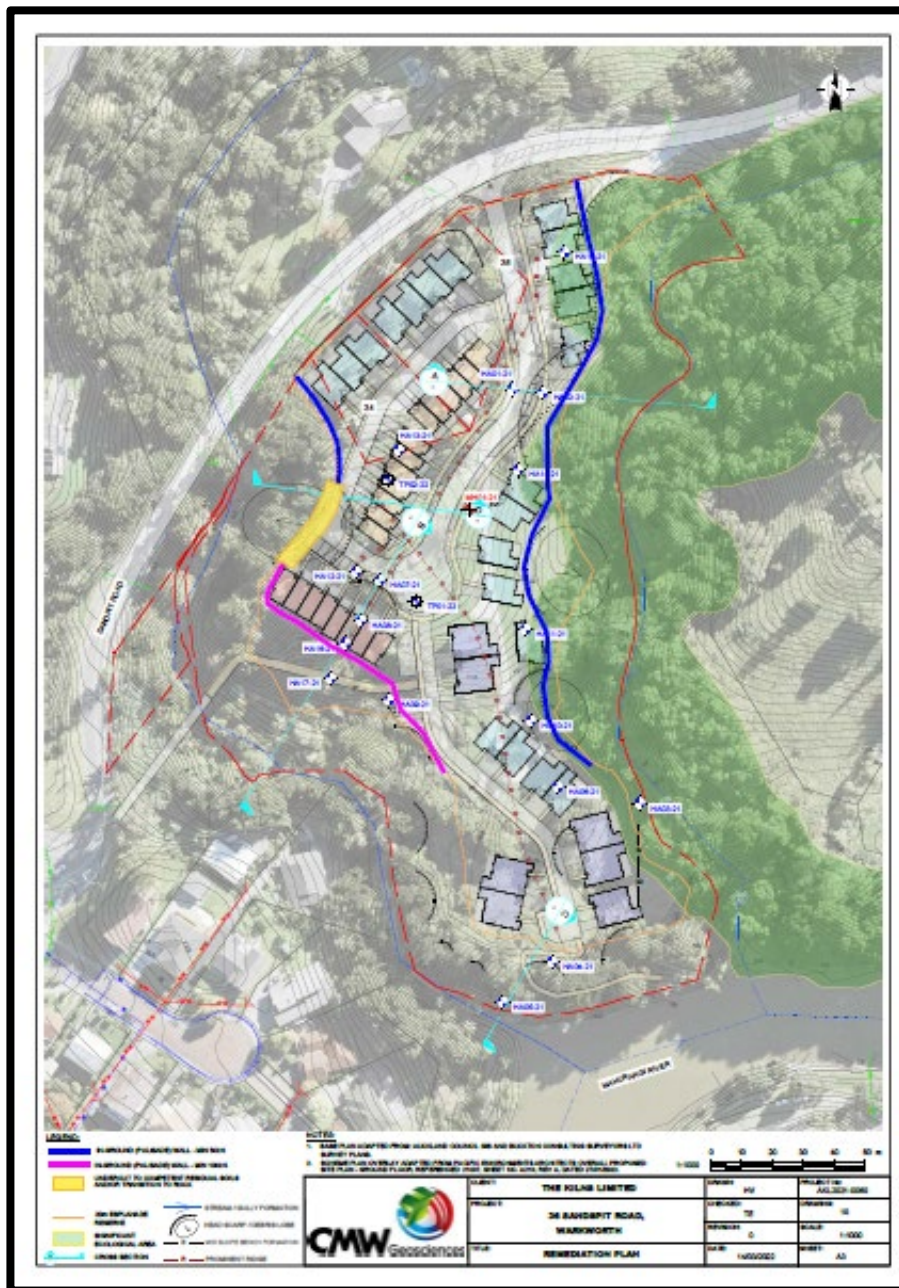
Drawing 10 – Geotechnical Remediation source: CMW Report
